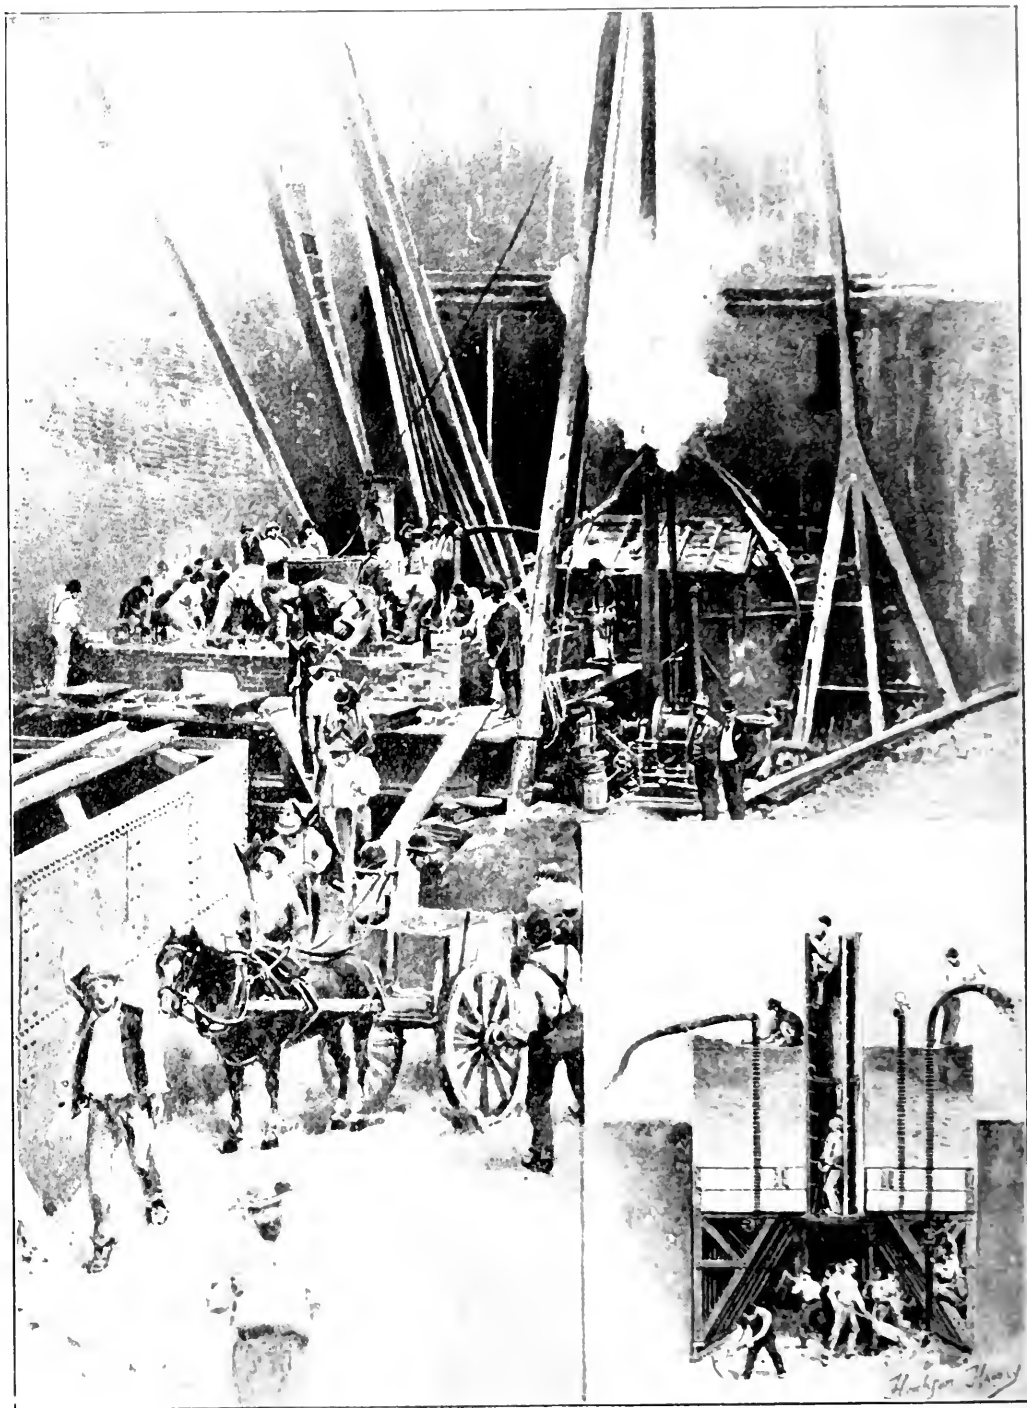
WORK ON FOUNDATION IN PROGRESS, MANHATTAN LIFE BUILDING, NEW YORK CITY.
